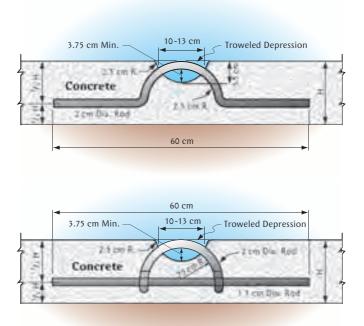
Tiedown Anchors for Concrete Paved Areas
